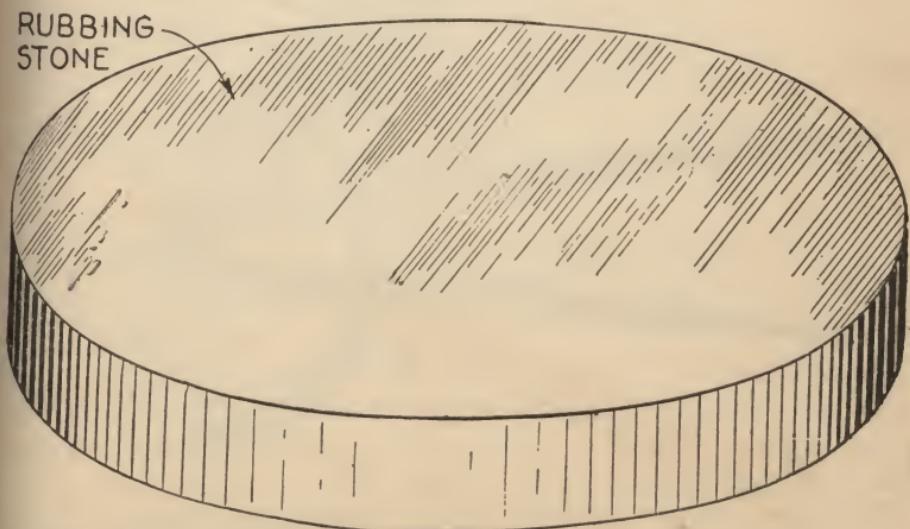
,947.—Rubbing stone for rubbing soft brick to fair surfaces.
